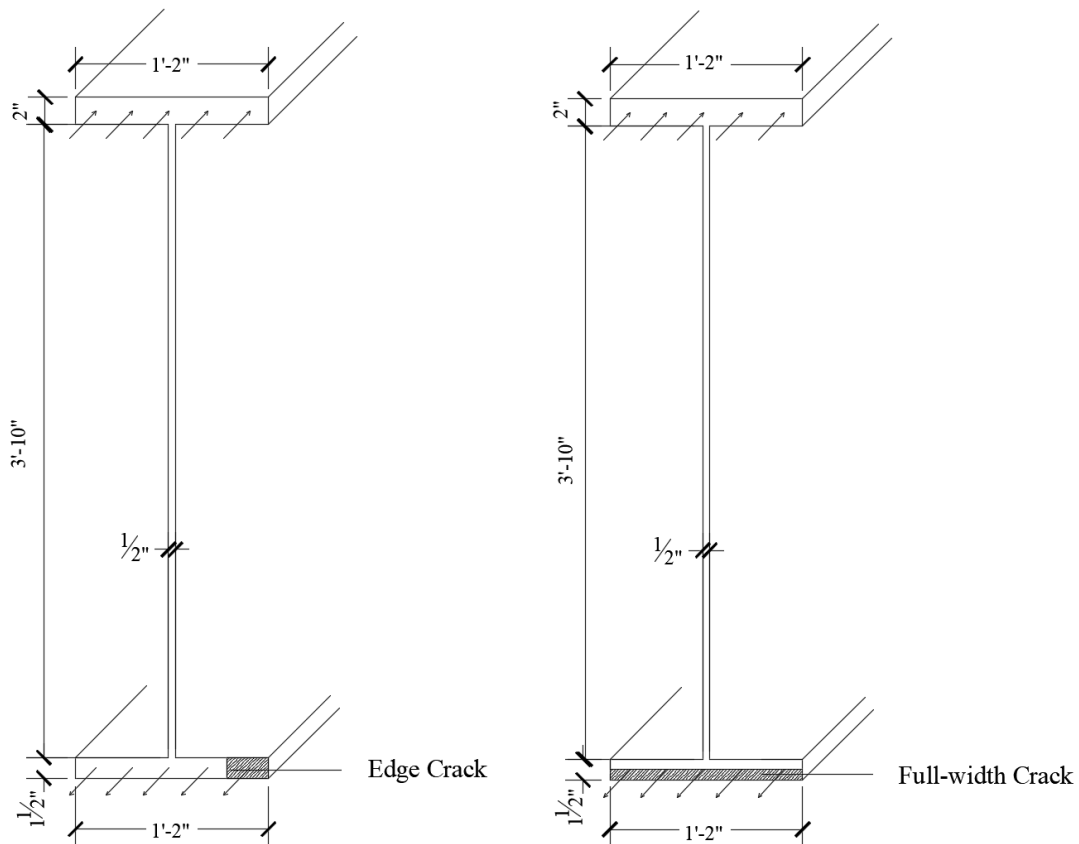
Flexural I-shaped Member with Edge Crack, and Full-width Crack Profile
